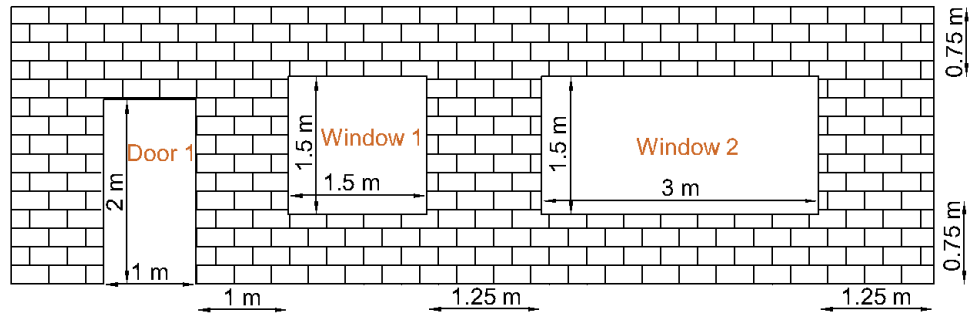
Example of the geometry of a façade of dimensions 10 m x 3 m with openings.
